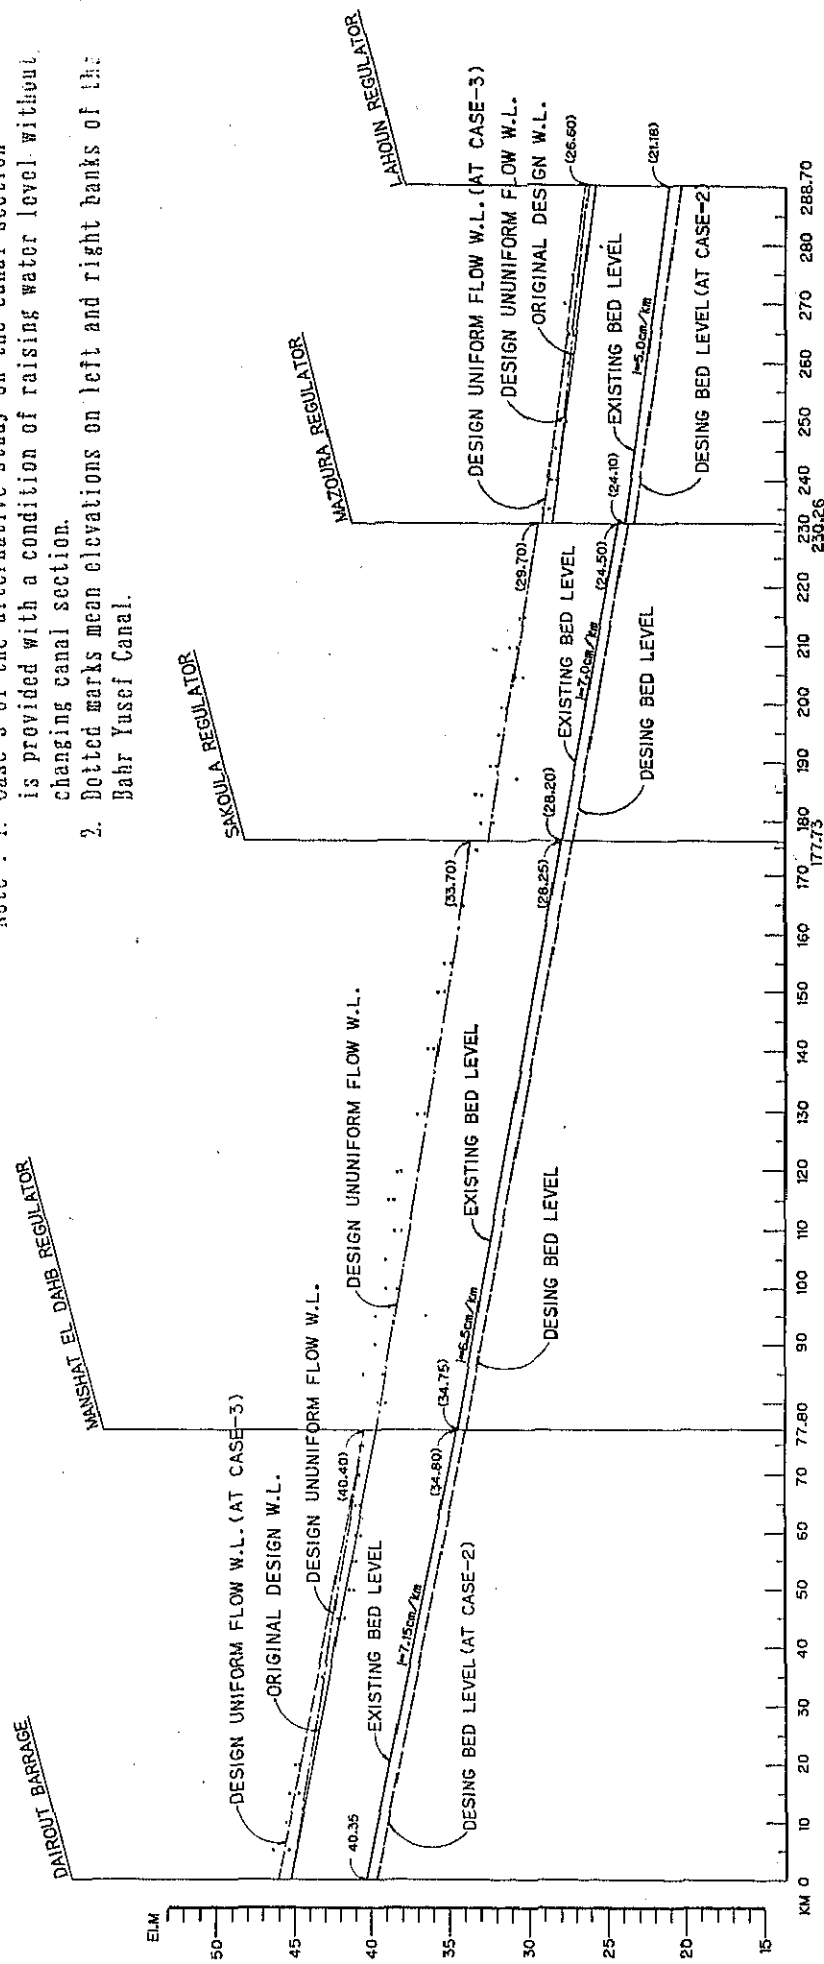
Hydraulic Profile of Bahr Yusef Canal (Deepen Canal Bed by 70 cm)
